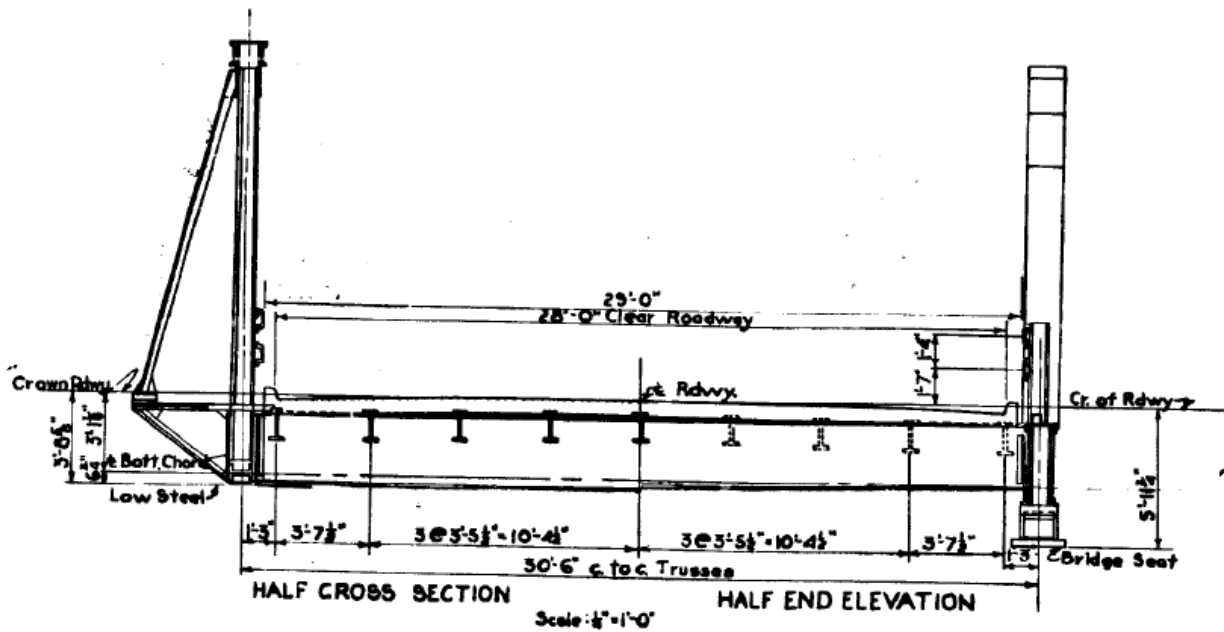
Typical Section of Span 2 of the Bridge (NBI 32200) (1940)
